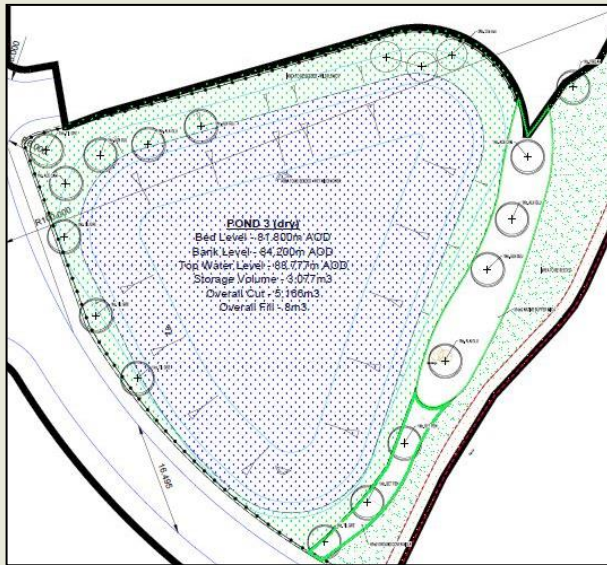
Proposed Blue Infrastructure Plan - Wormwald Burrows Drainage Strategy 2019
